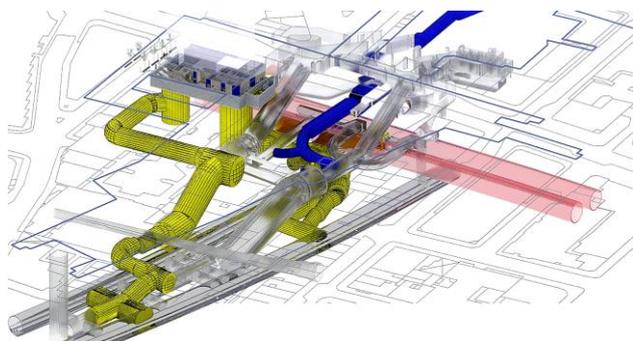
3D model view of Bond Street Station Upgrade. Existing tunnels in transparent colours, new tunnels in yellow (London Underground) and blue (Crossrail link).
